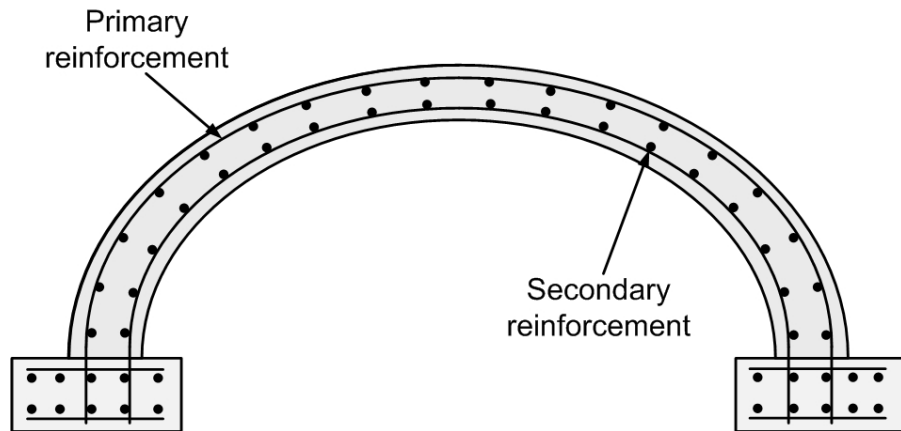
Steel Reinforcement in a Concrete Arch Culvert
